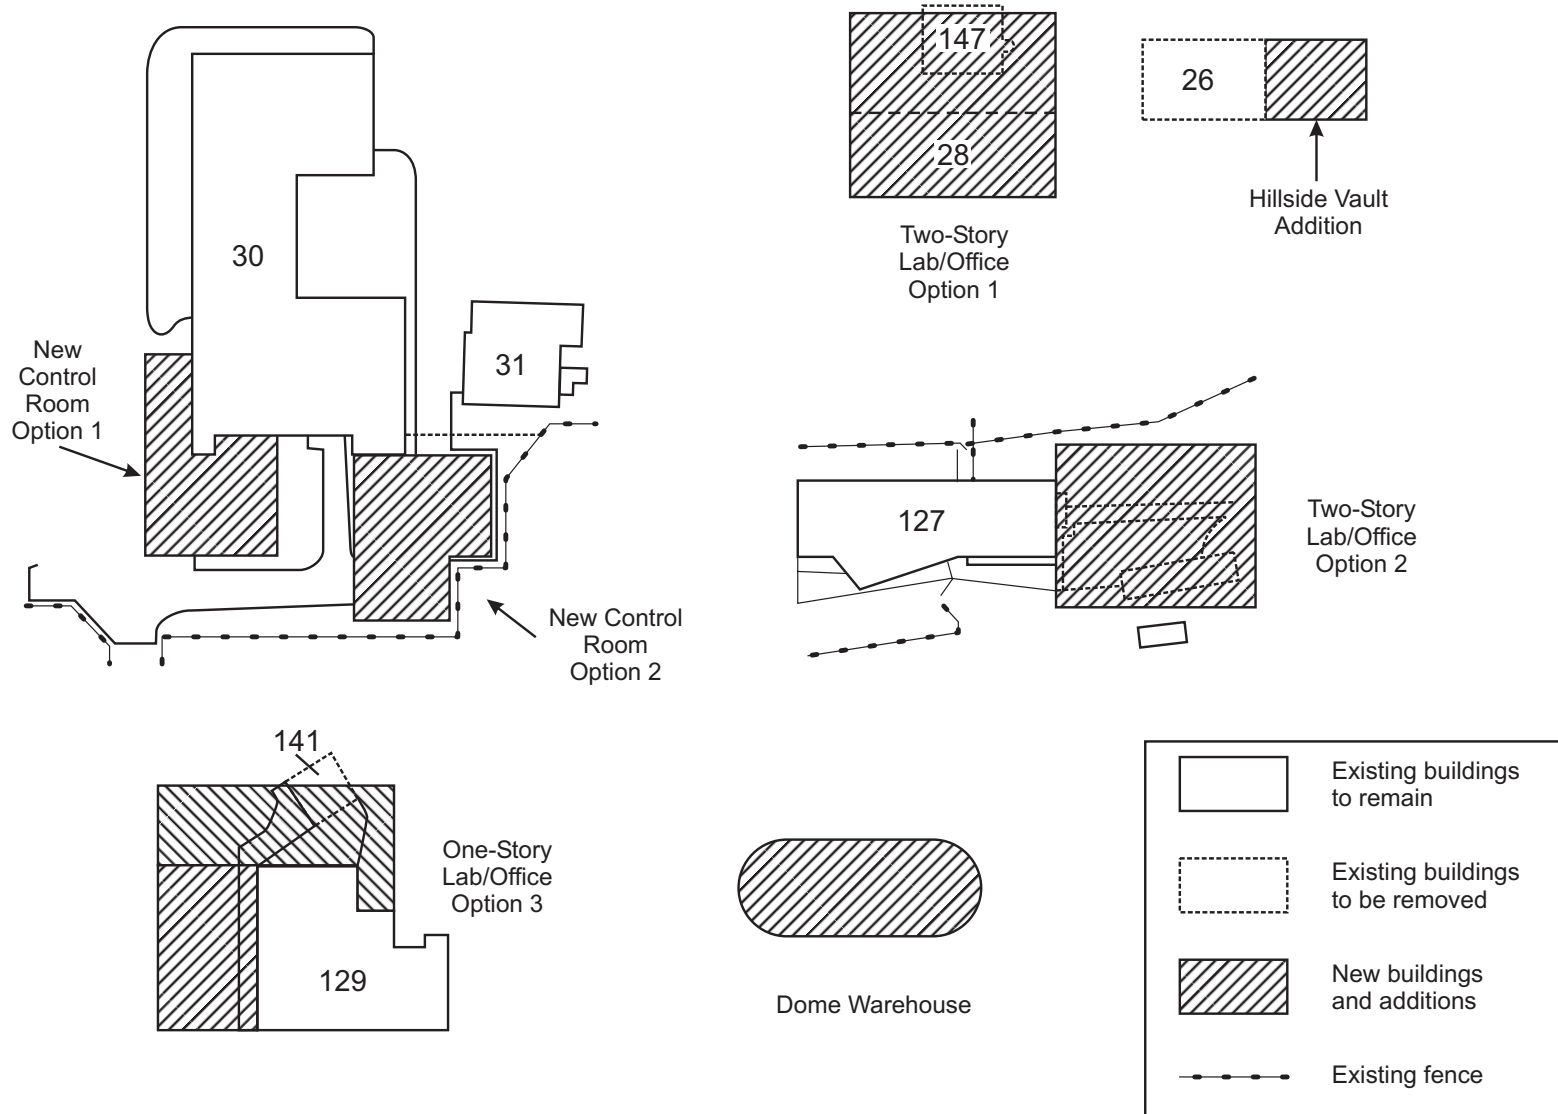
TA-18 Proposed New Construction (TA-18 Upgrade Alternative)
